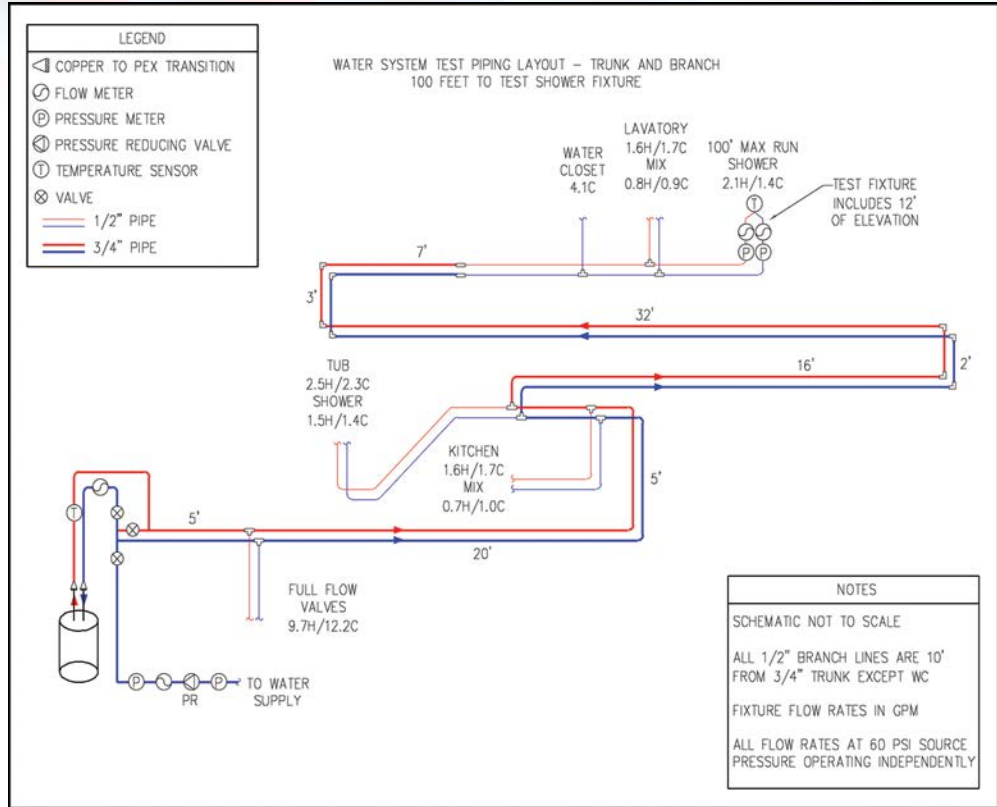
Water System Test Piping Layout – Trunk and Branch, 100' to TF
